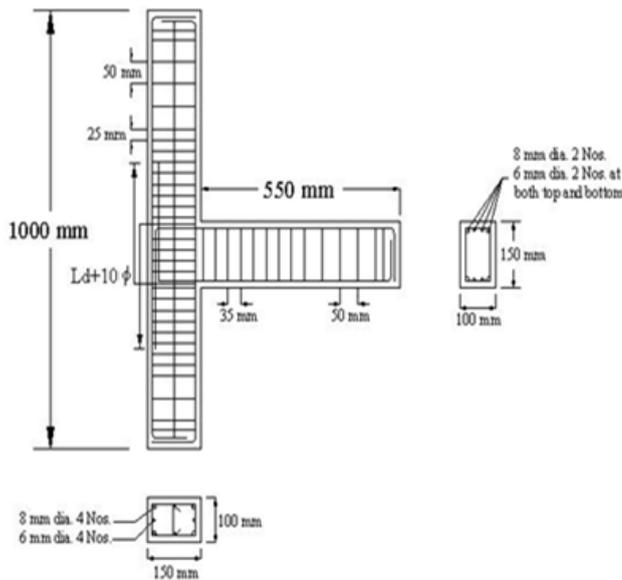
Reinforcement details of the beam-column joint specimen as per IS456 (BIS,2000)
